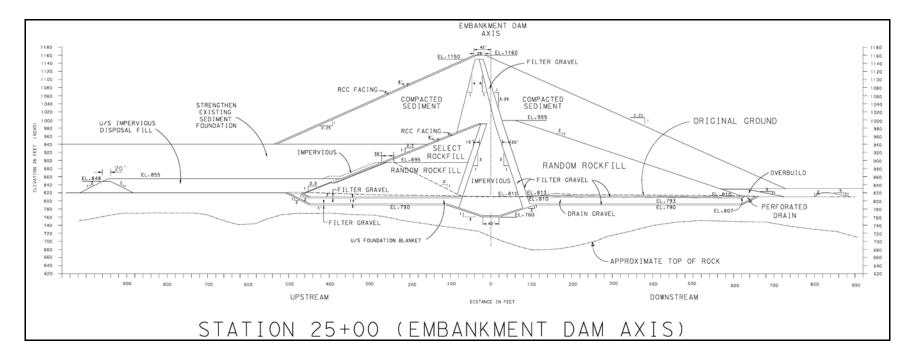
Section of Potential SRS Embankment Raised 160 feet, Configuration 1
